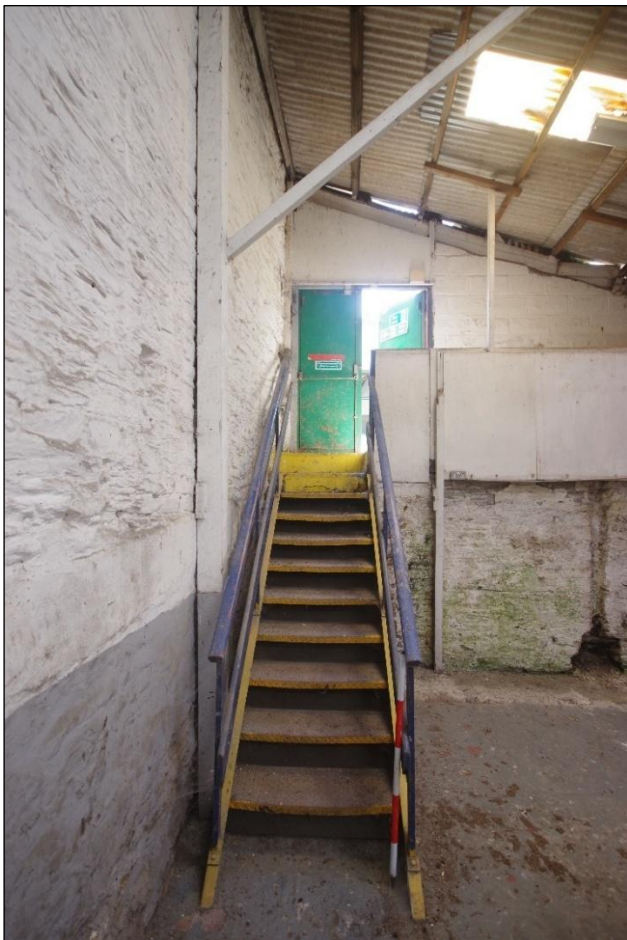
Staircase fixed to Interior east and south walls (south end) of the extension to Room 1 (Garage).
